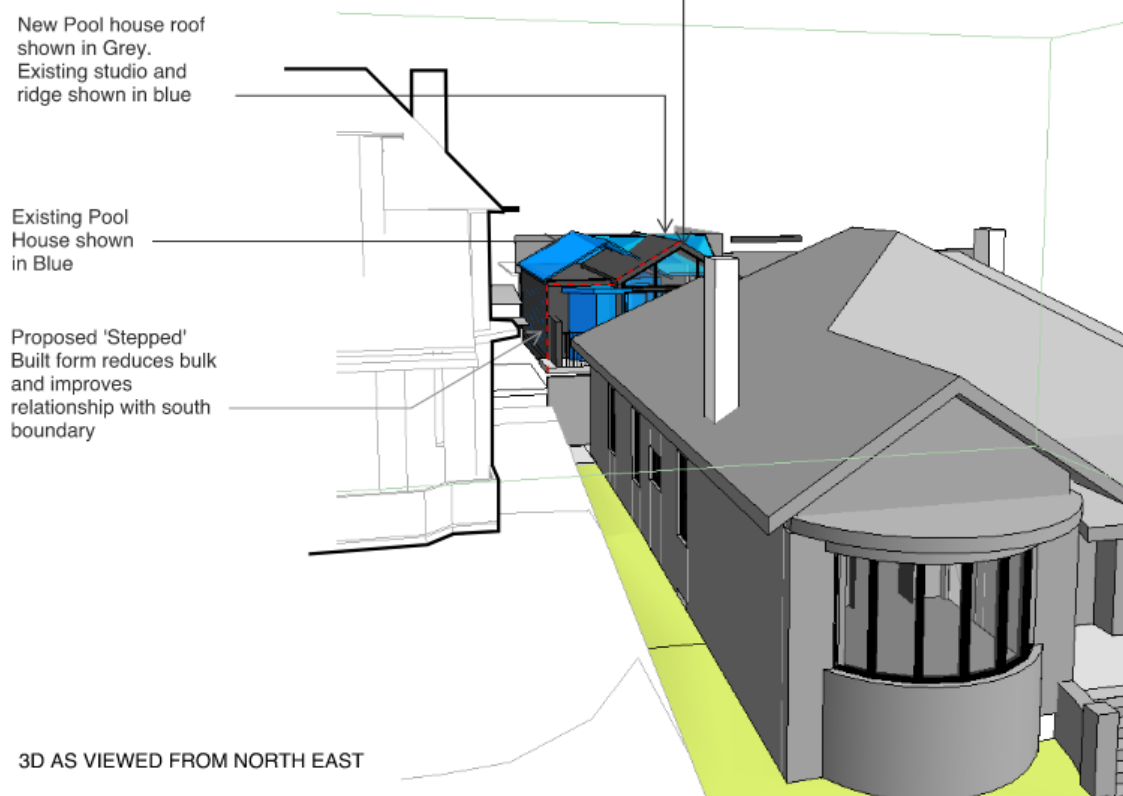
3D image of proposed pool house as Amended shown in grey and current pool house shown in blue. The proposed pool house displays a more slender roof form than the existing.
